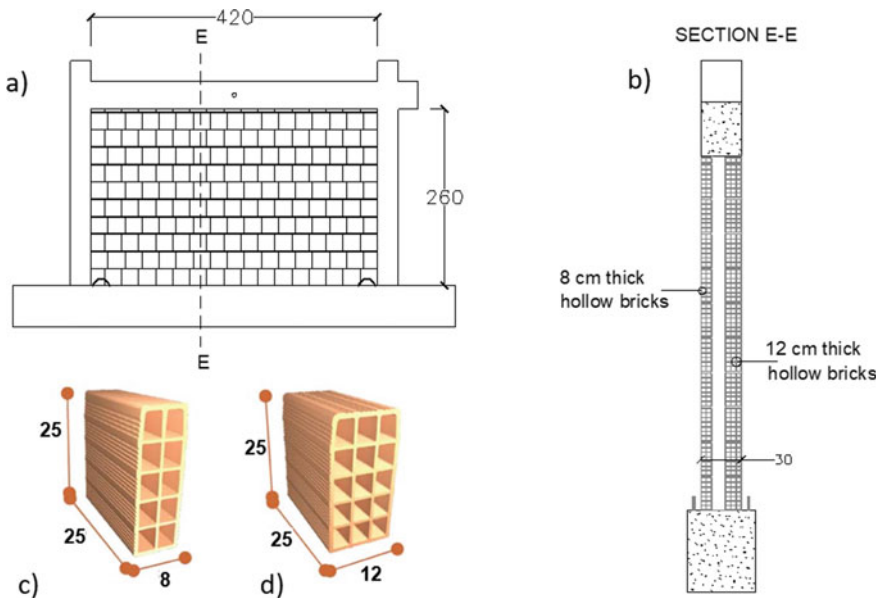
Full-scale portal frame (a), section view (b) of the double layer infill made of 8 cm (c) and 12 cm (d) thick brick units (dimensions in cm)
